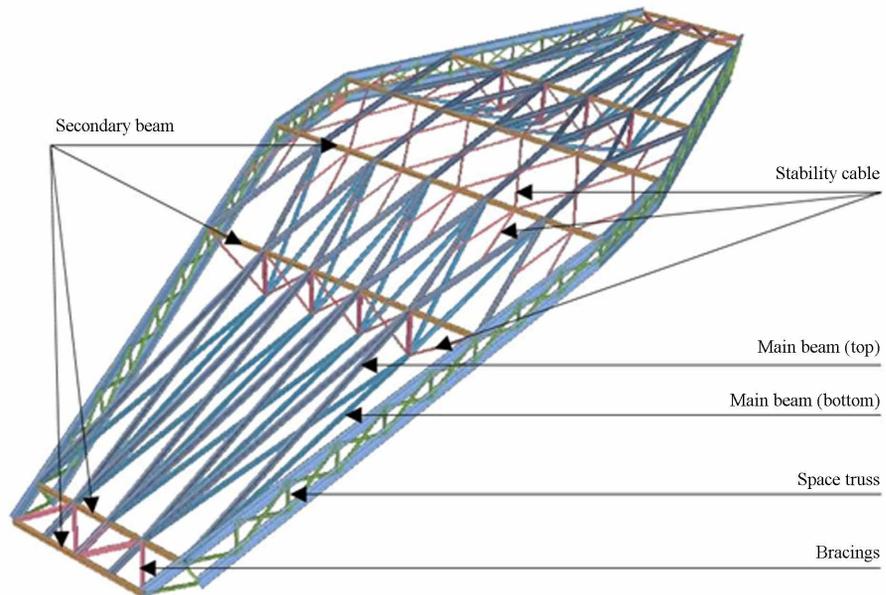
Typical structure for one sub-roof (Yang et al., 2018)
